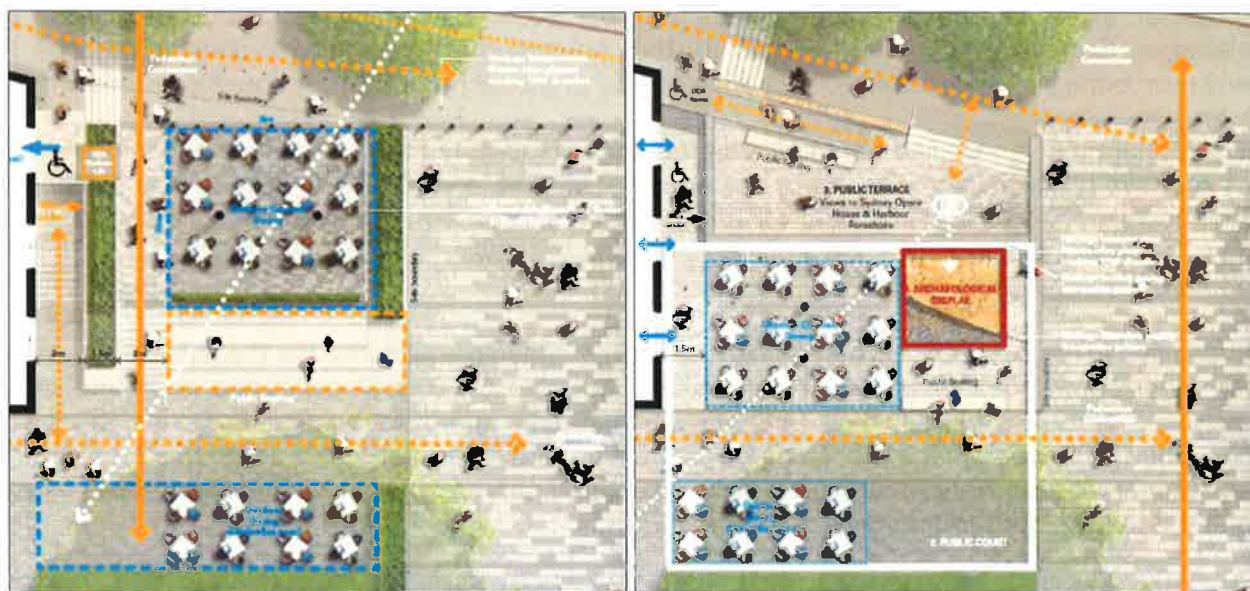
Public access routes as approved (left) and proposed (right) (Source: Applicant's modification).
